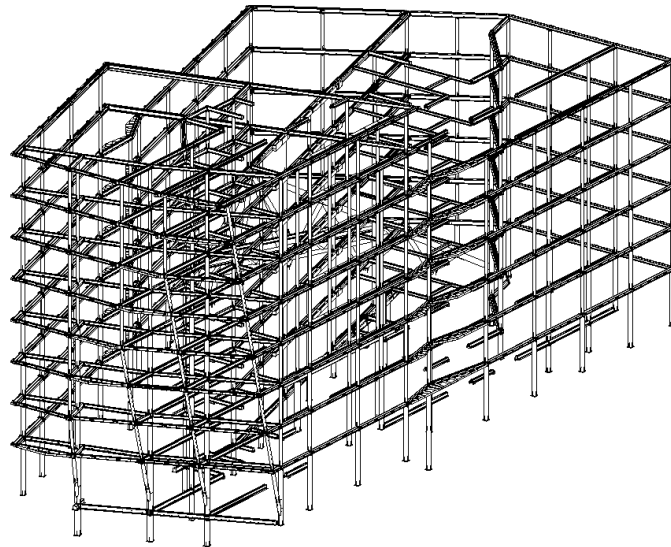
, a 3D model of the building structure, taken from Wilhborgs
